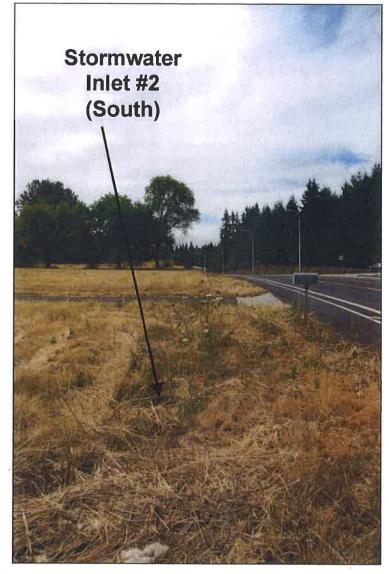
Looking southerly at widened road. The new stormwater Inlet #2 (South) is in the foreground. The curbing on the east edge of the road (on left) now blocks the adjacent catchment stormflow and redirects it to the culvert discharging to the Lucini property. This photo was taken by LEA on July 16, 2015.
